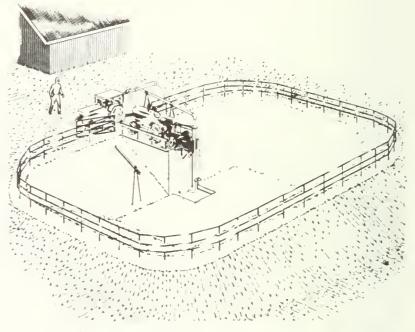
Clay-lined manure storage pond with dumping dock (CPS Plan 2371)
